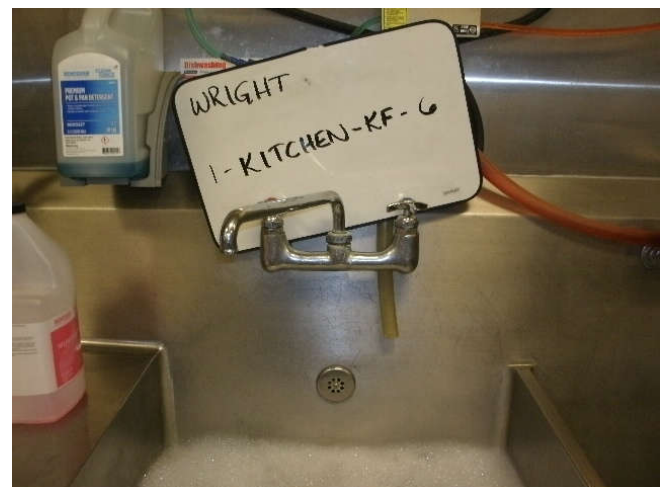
Kitchen faucet, located on the 1st floor in the kitchen against the wall – left fixture (dish washing).
